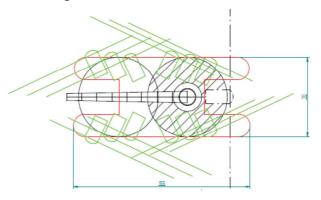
SWATH LAYOUT DESIGN WITH WTG'S AND CRANE ARRANGEMENT
